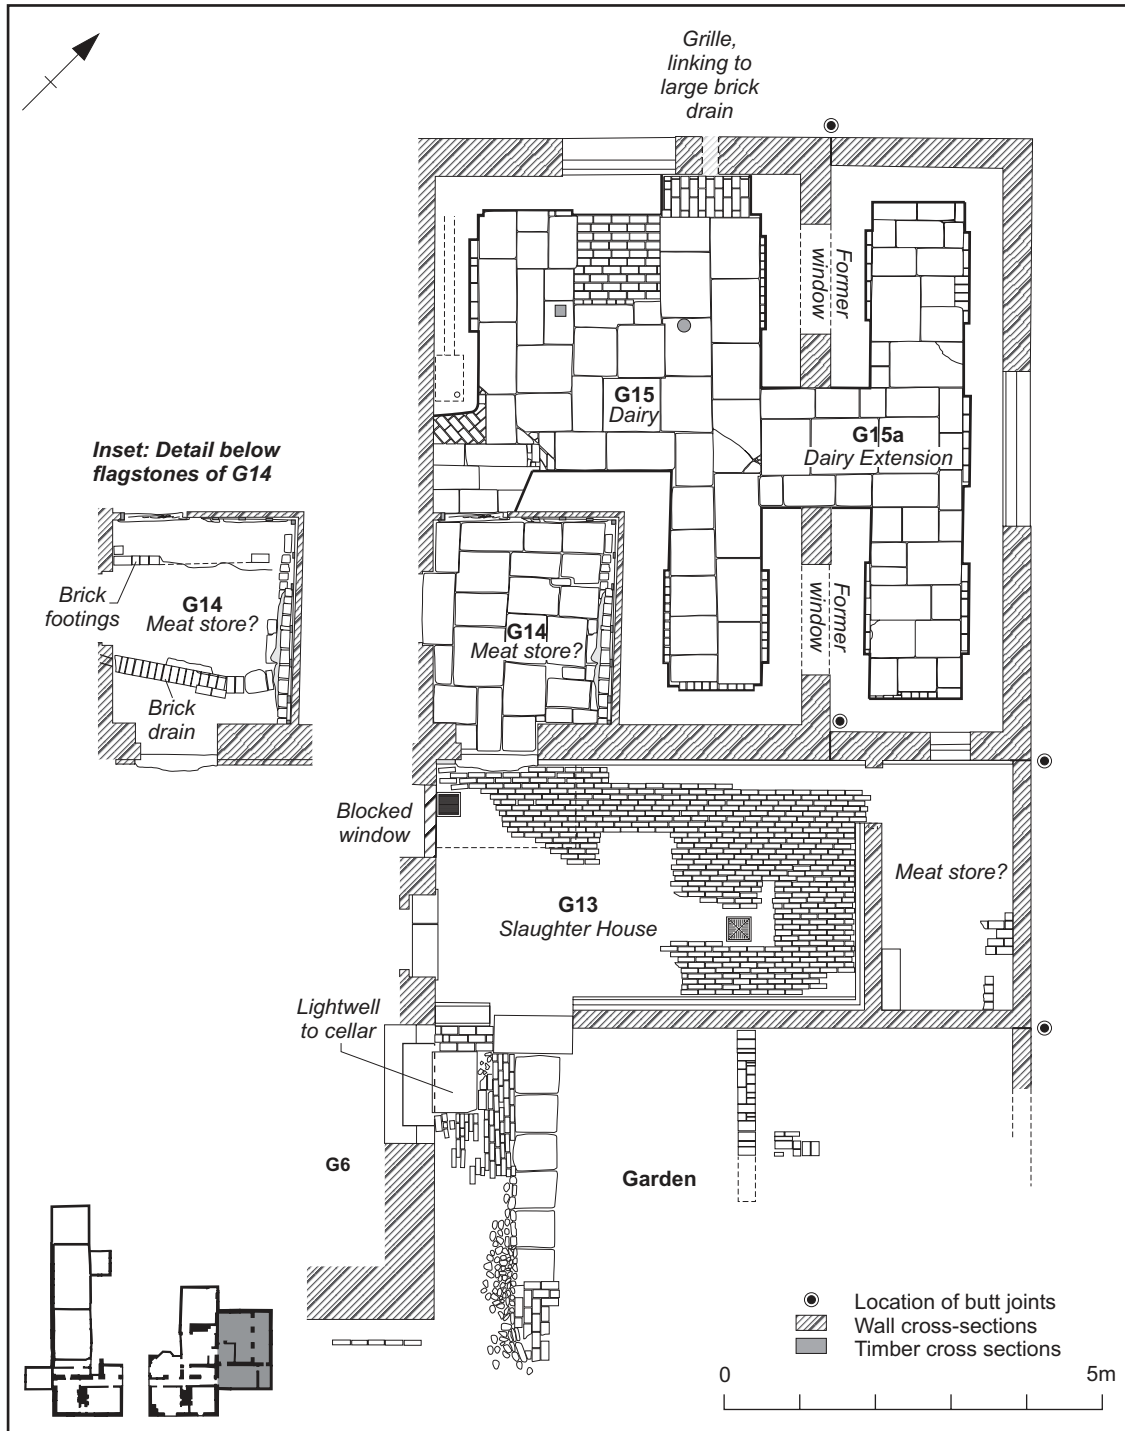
Plan of the dairy, meat store and slaughterhouse
